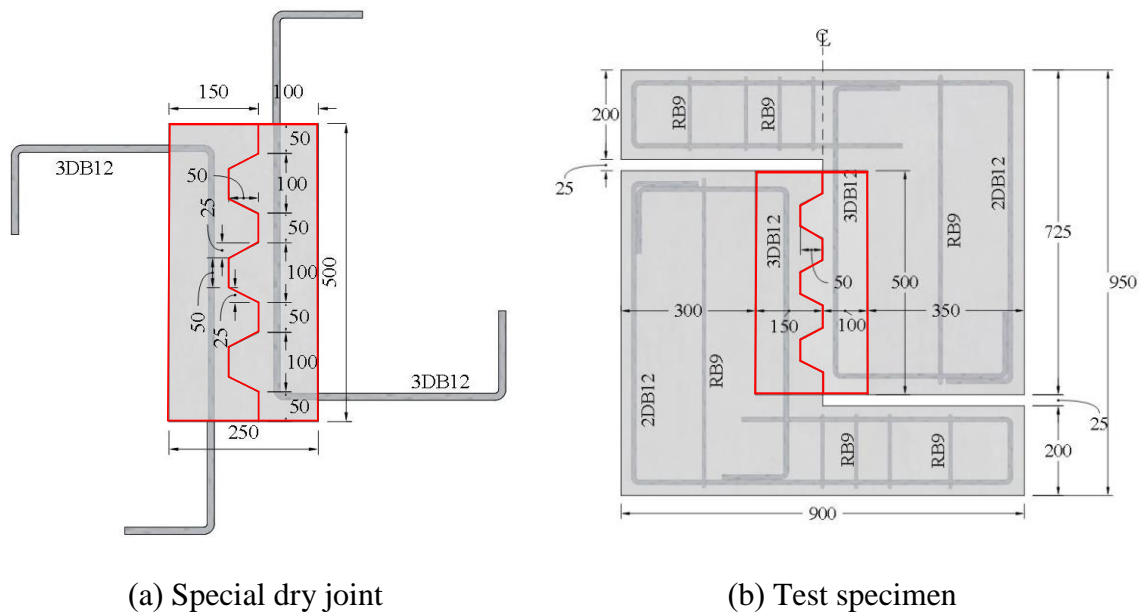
Specimen geometry and reinforcing steel detailing (dimensions in mm.)
